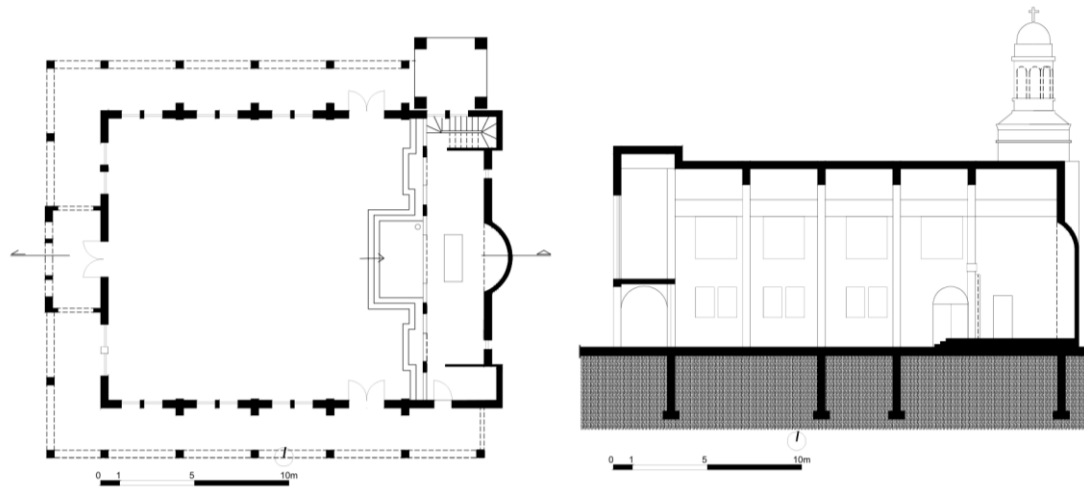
St. Andrew church plan and section, drawn by the author based on Prist Nizar al-Mabardi.
